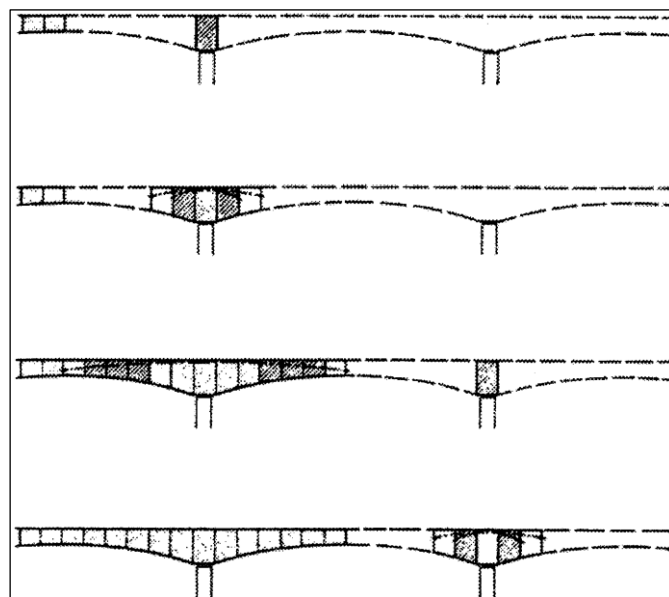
Balanced cantilever construction (Chen and Duan, 2000)
